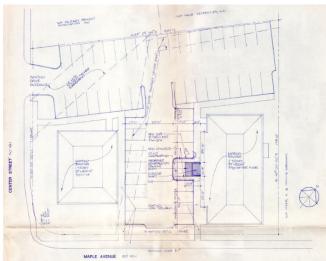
1990 plan for elevator addition to 2-story building at 102 Maple Ave E
